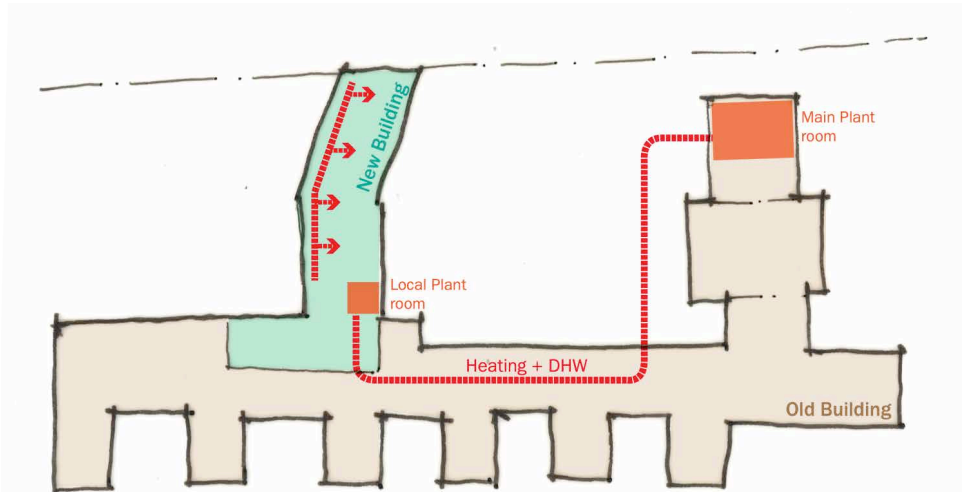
Diagram showing the route of the pipework linking the Old Building's plant room to the New Building
